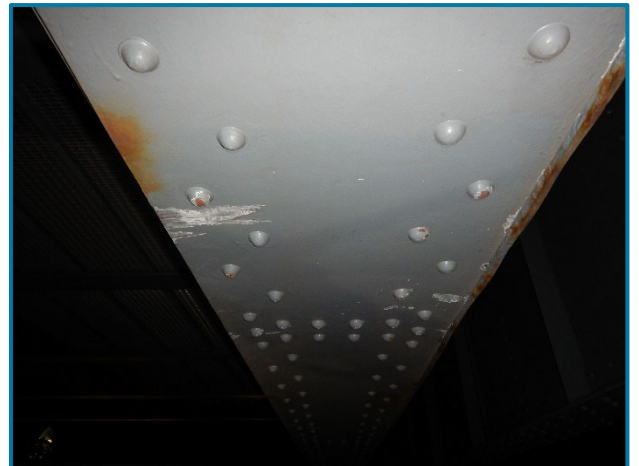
Minor scrape on the underside of the River Pier Cap bottom flange between Girders B and C (looking east).
